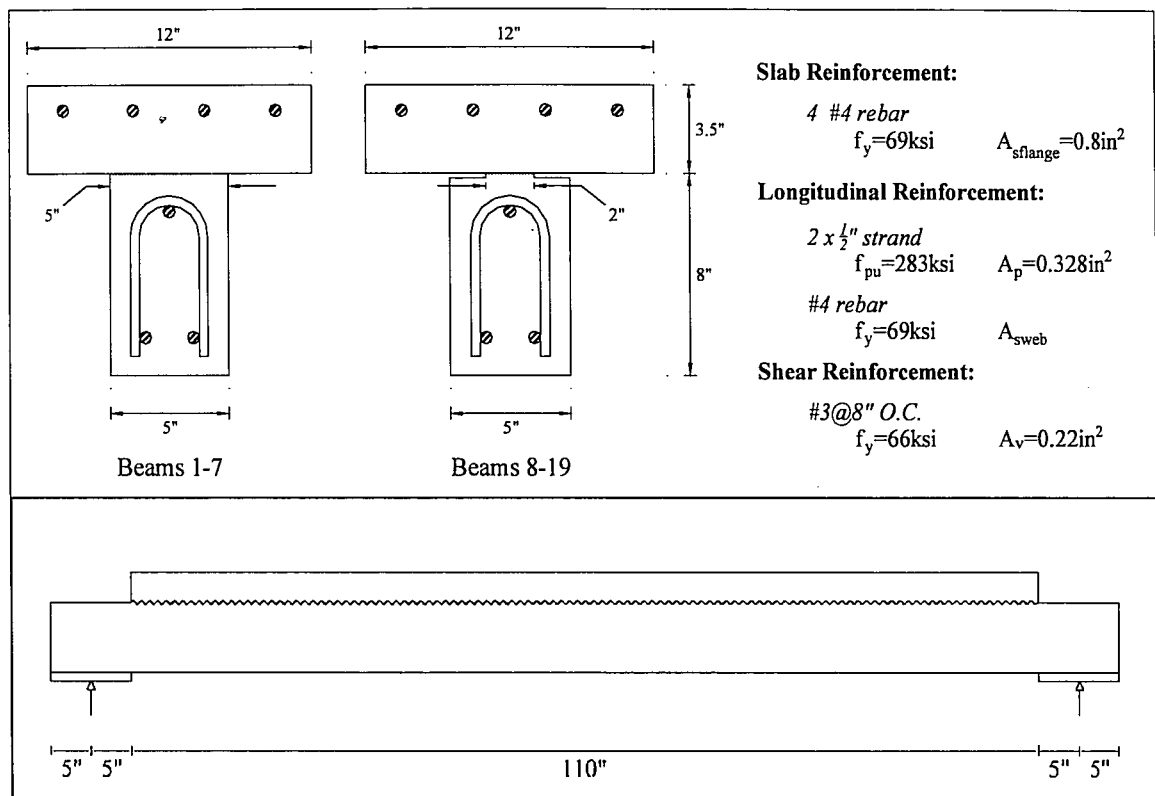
Cross-Section and Elevation View of Beams Tested By Deschenes and Naito
